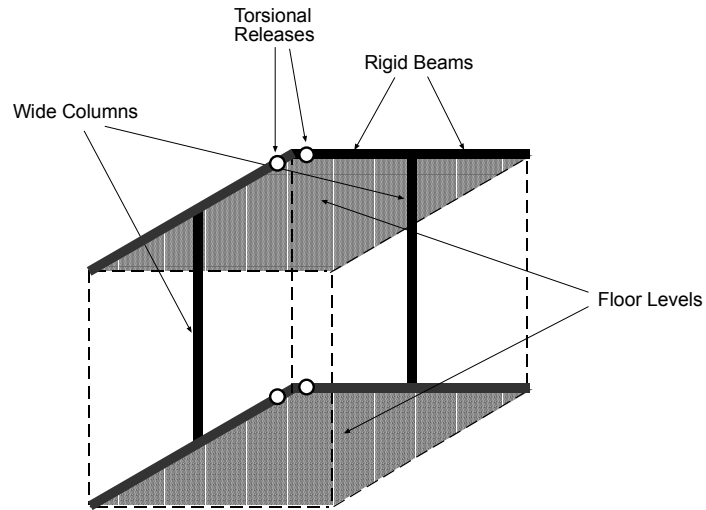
Connection Details of Two Orthogonal Shear Walls
